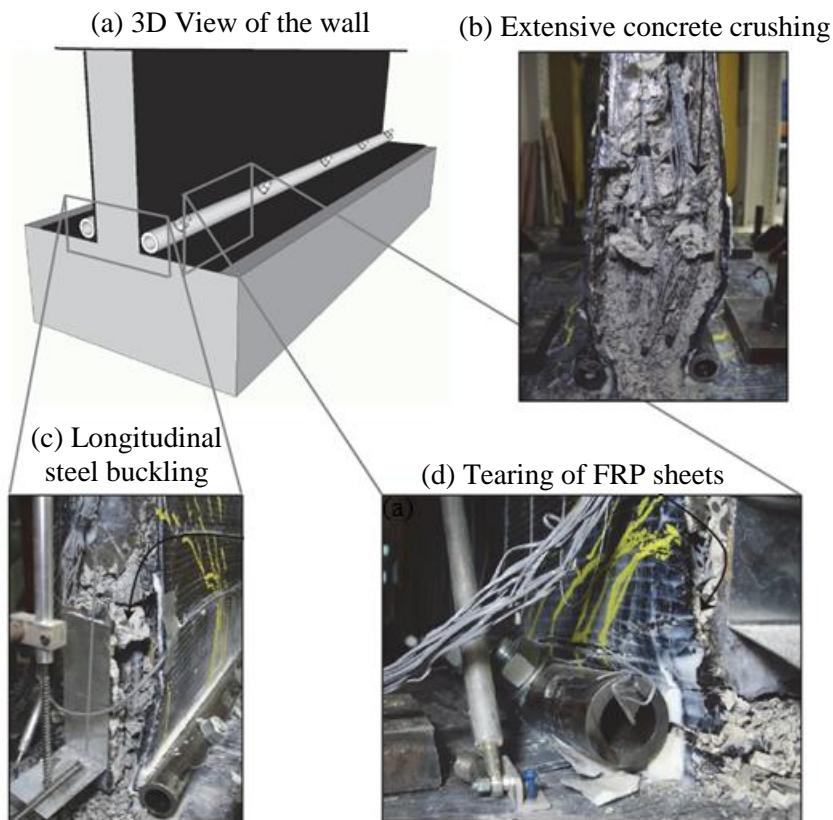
Different stages of failure in FRP strengthened wall (Woods, 2014)
